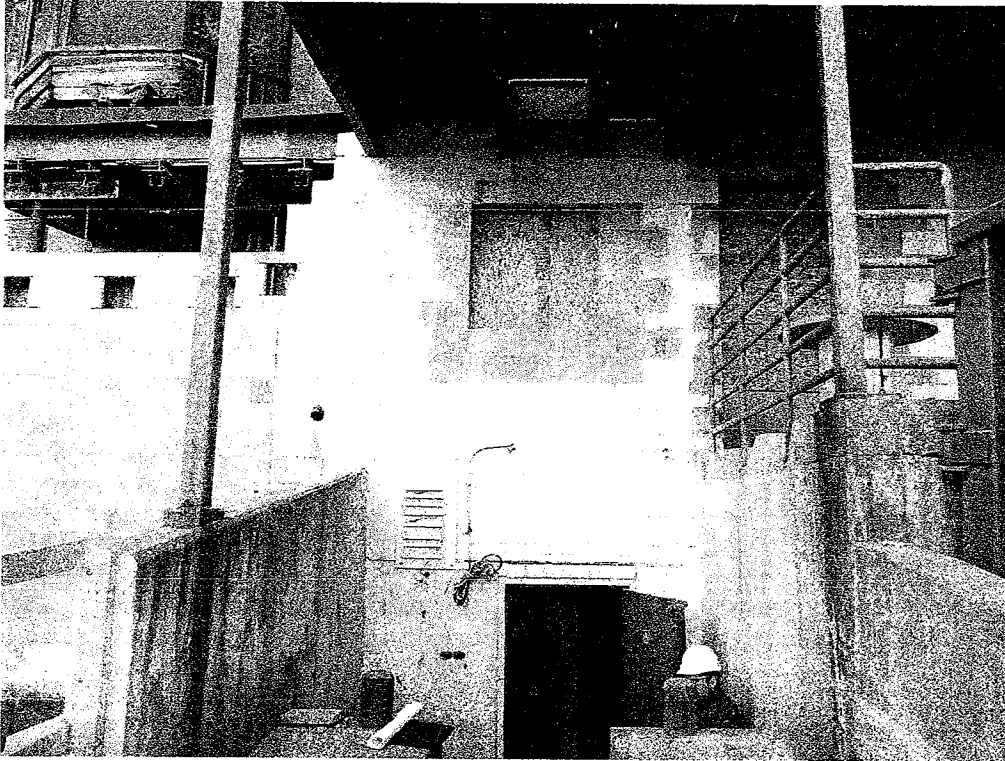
Elevation looking south at grid F.4 (see attached elevation C-C)
